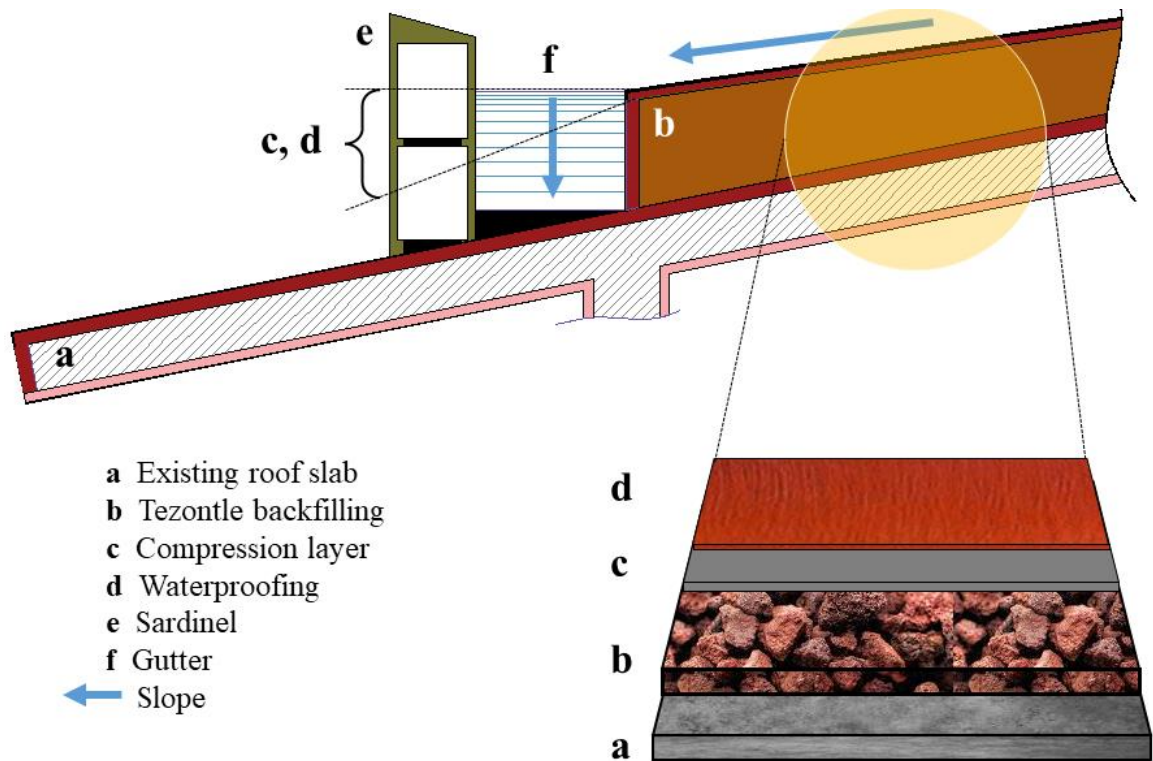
Roof slab retrofitting with tezontle to generate slopes and catchment gutter in the pattern single-family household.
